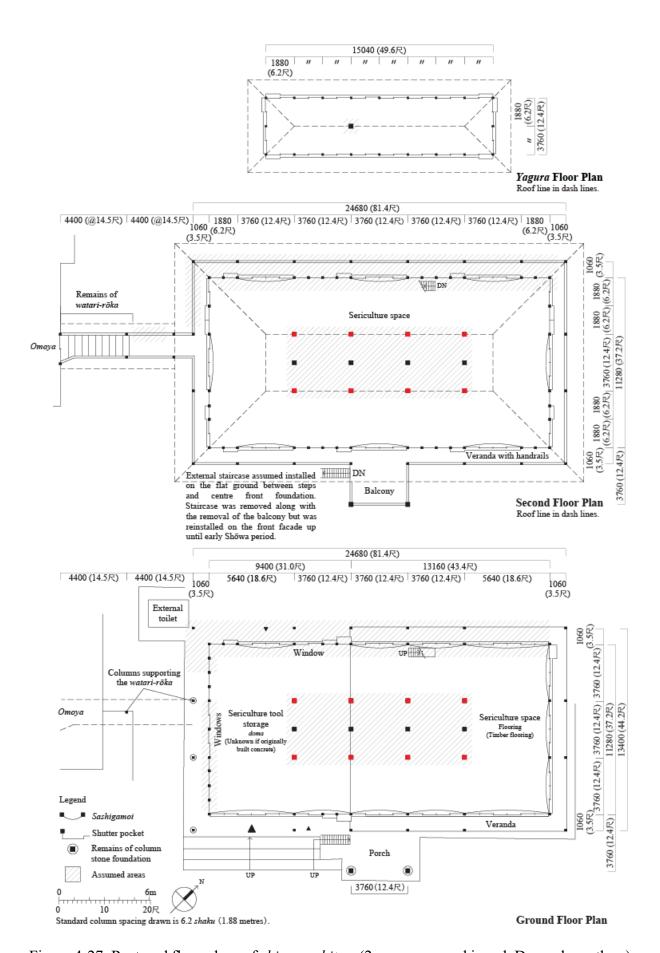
Restored floor plans of shin-sanshitsu. (2-rows proposal in red. Drawn by author.)
